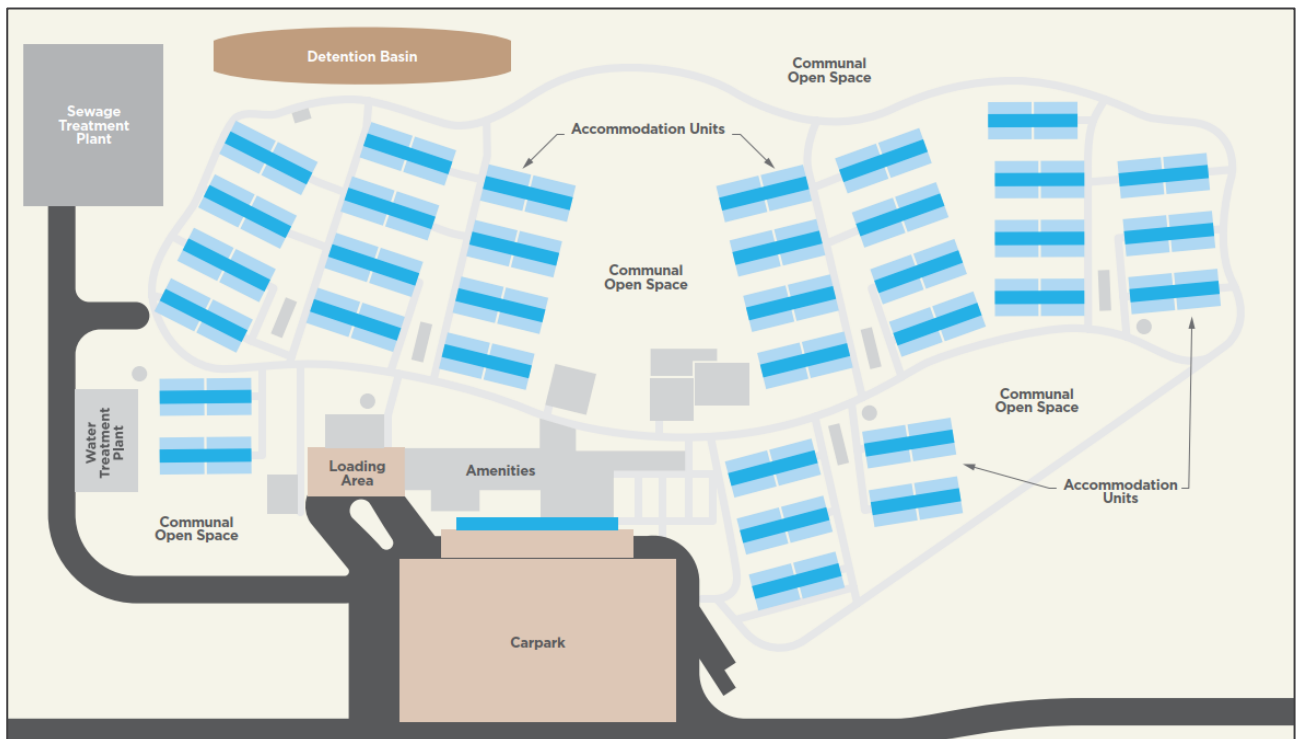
EXAMPLE CONSTRUCTION CAMP LAYOUT
